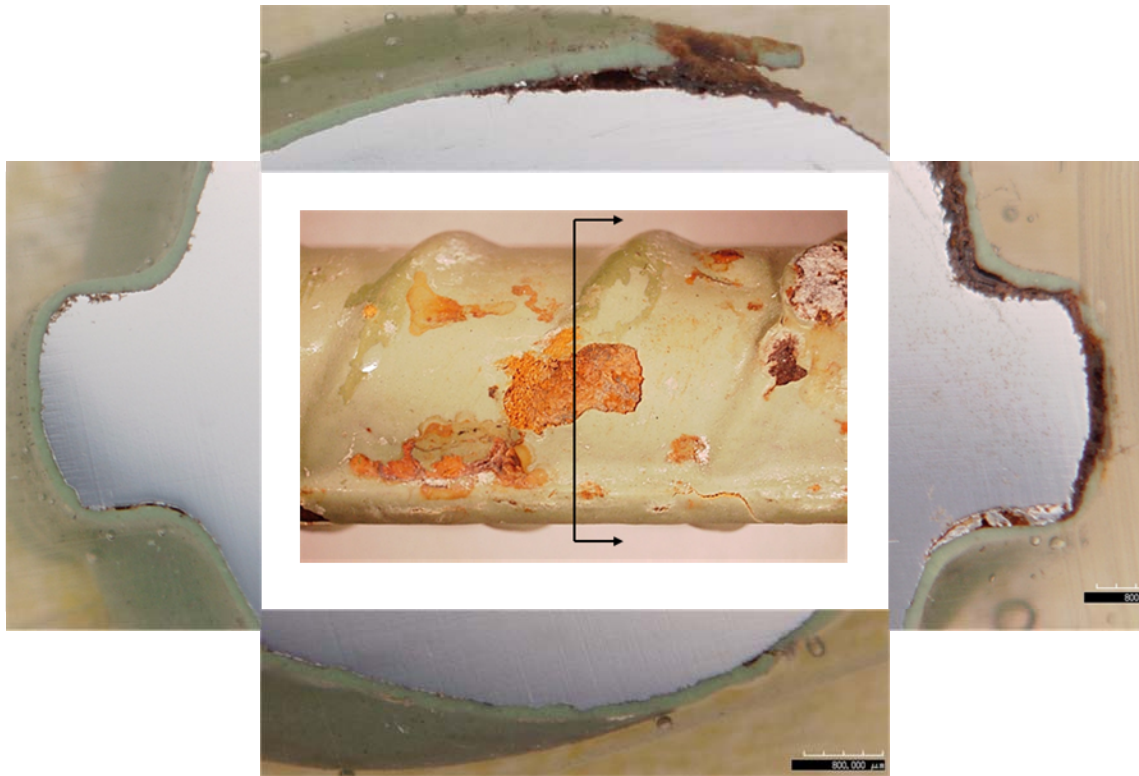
A cross-section through an intentionally damaged area along bar-3 of specimen EP-D-2.
